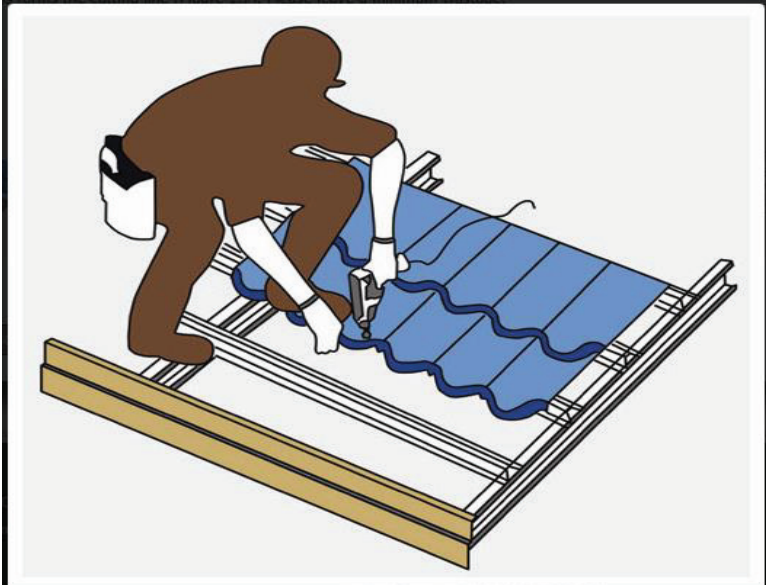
The person nailing should stand on the tile to be installed facing the fascia and nailing as shown below.
